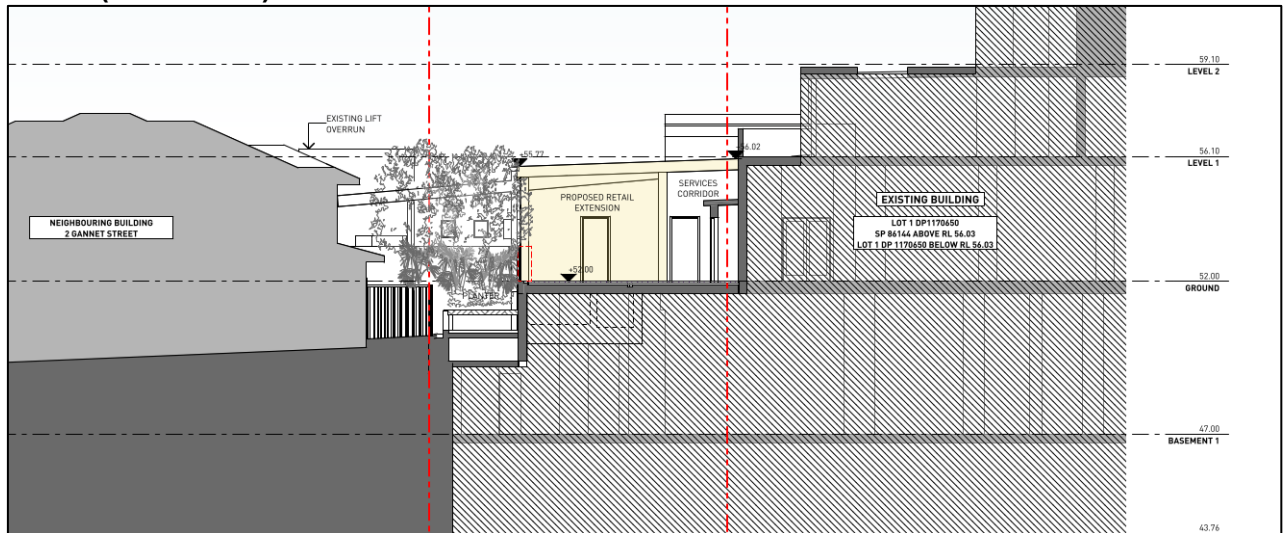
Section A plan showing proposed extension located above Basement 1 and Basement 2 levels (shaded in yellow)
